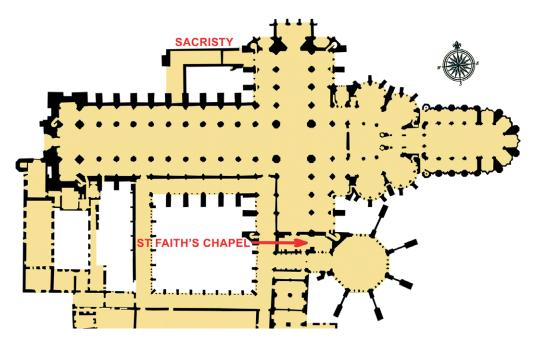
Plan of Westminster Abbey. Drawing: Adapted from RCHM 1924.
